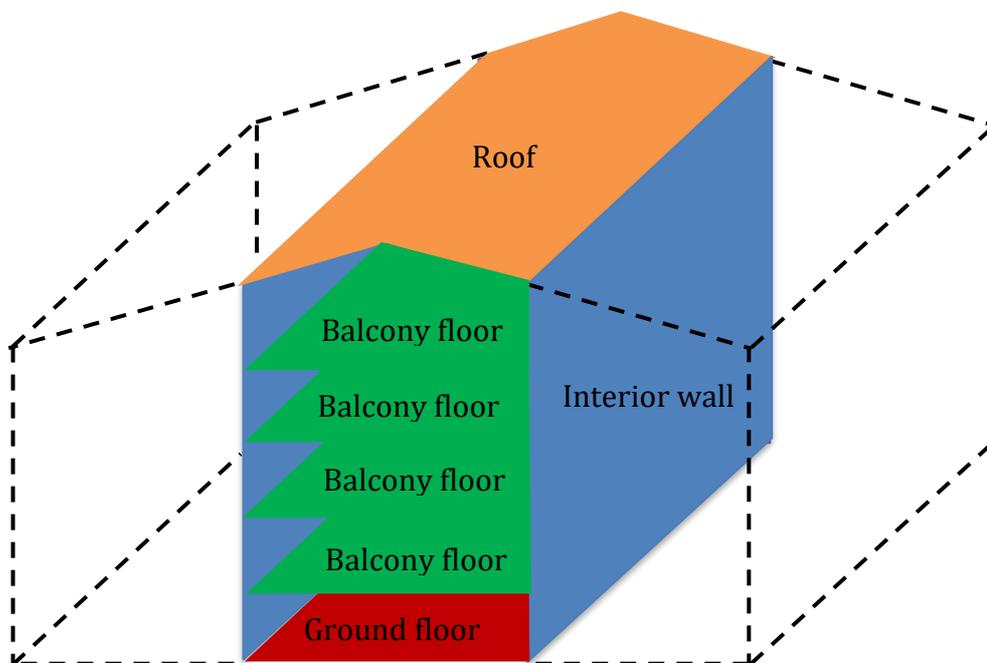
Placement of ground floor, balcony floor, interior wall and roof.
